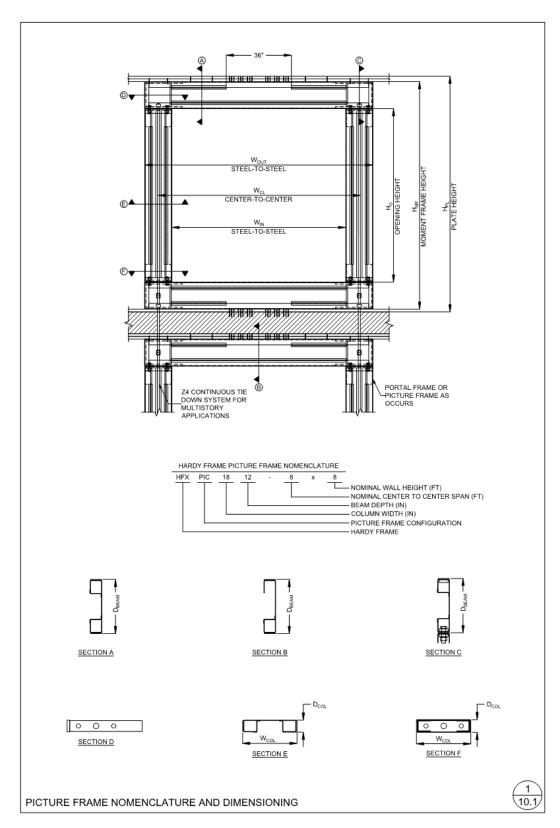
PICTURE FRAME INSTALLATION DETAILS
